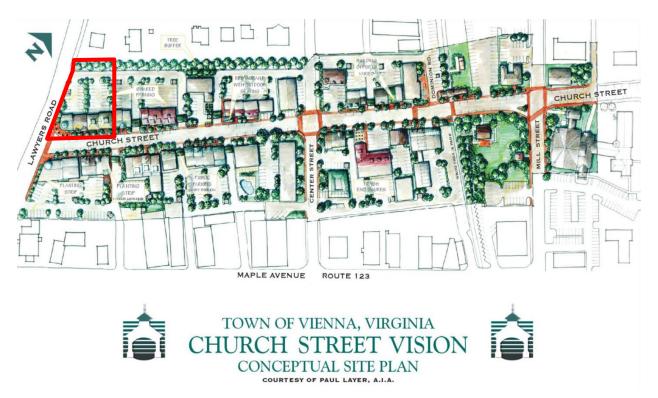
Church Street Conceptual Site Plan with subject property outlined in red
